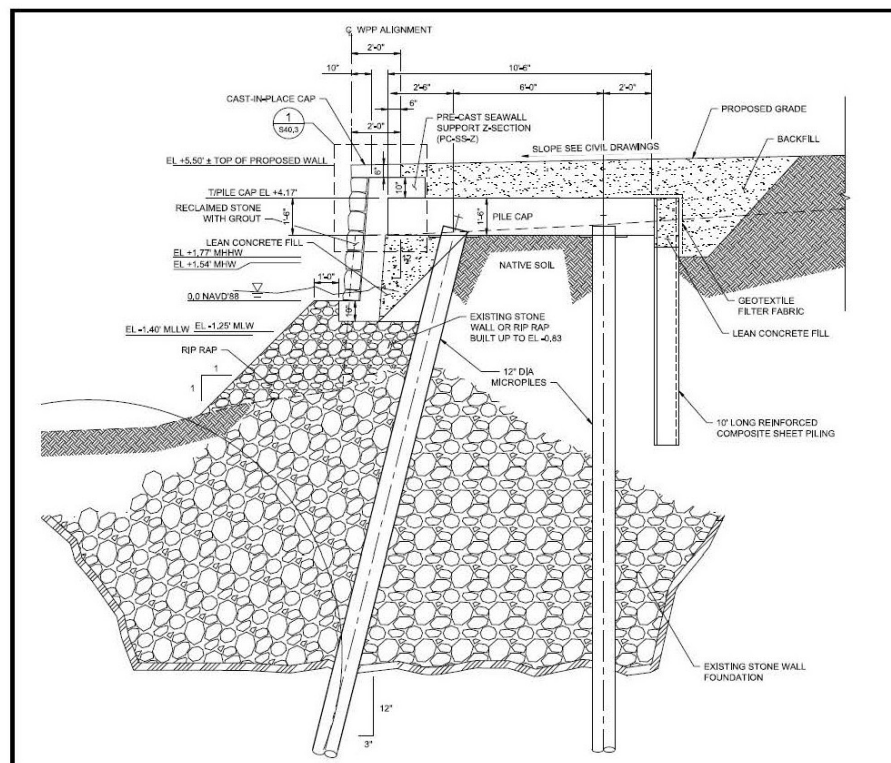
West Potomac Park – Proposed Seawall Section (Typical)
